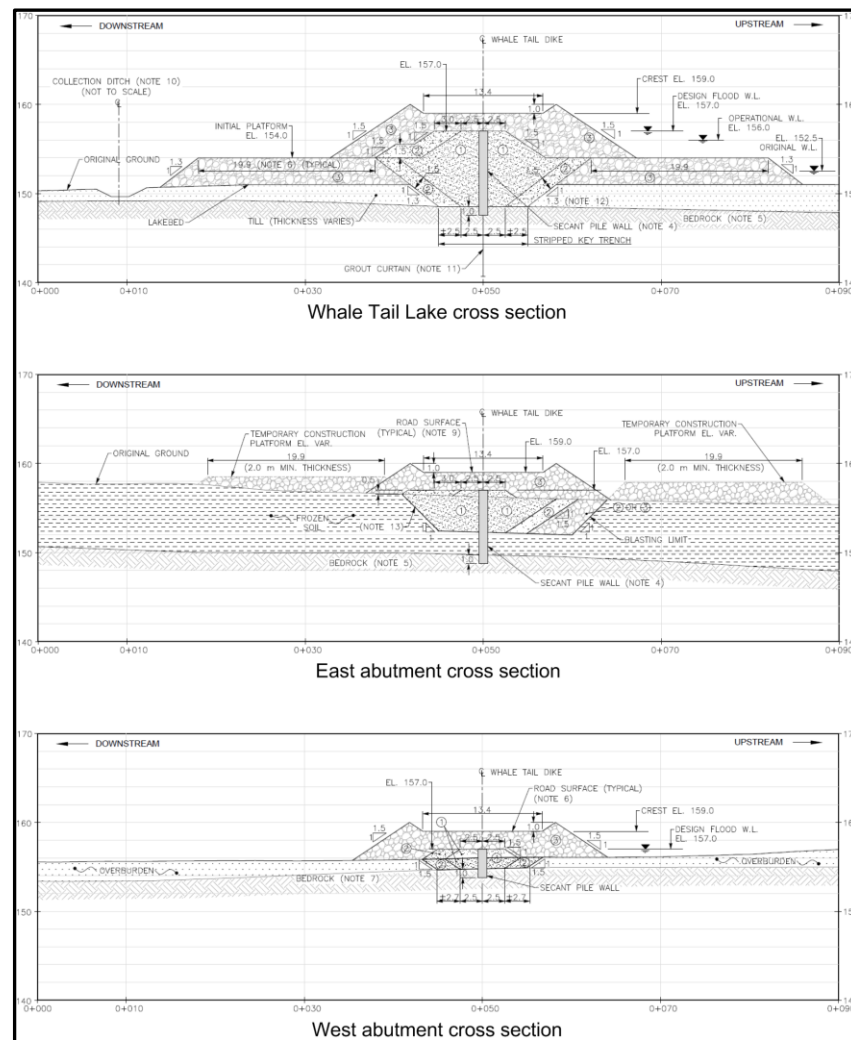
Typical Sections of Whale Tail Dike and Whale Tail Dike Abutment
